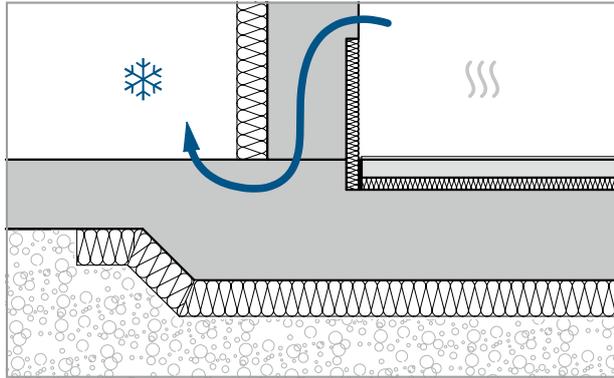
Pos. ①: Heat flow in underground garage wall with flank insulation
